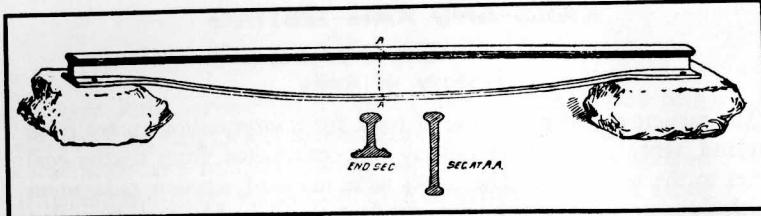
Edge rail, made of cast iron in 6-foot sections, for use with flanged wheels.
